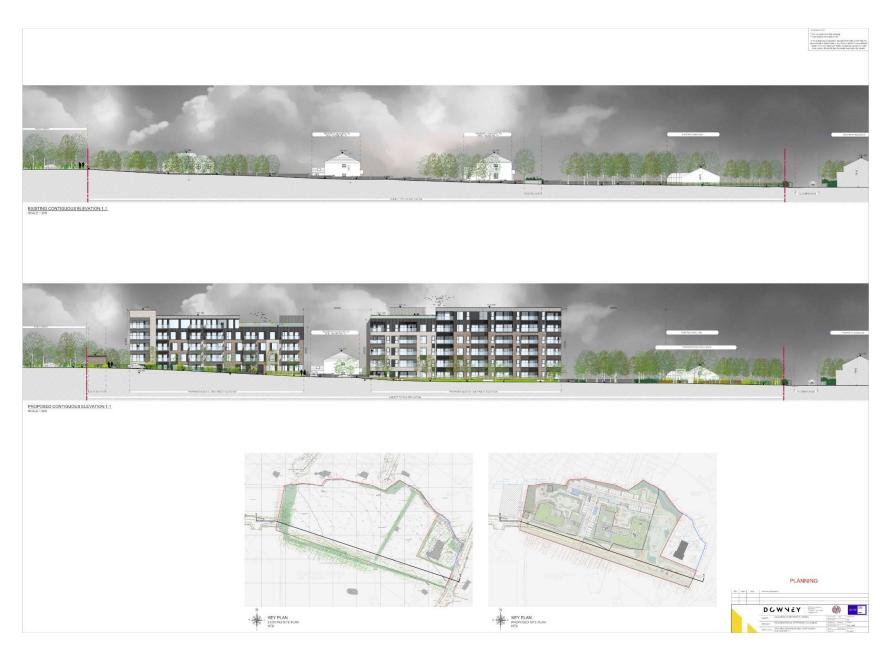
Existing and Proposed Contiguous Elevations 1.1
